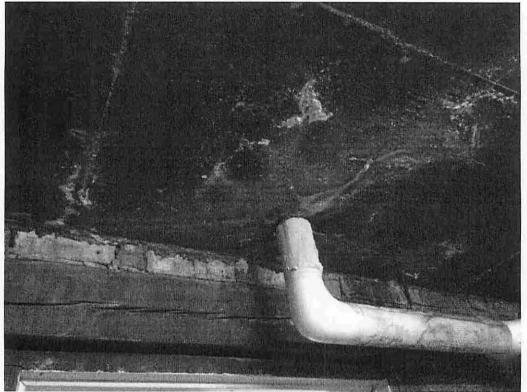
Corrosion, spalls and efflorescence due to leaking at floor drain.
